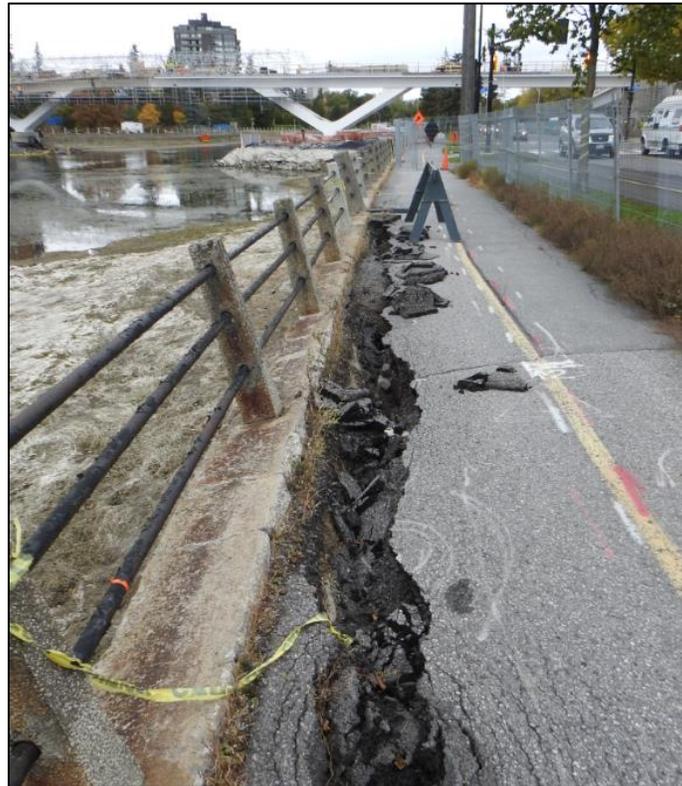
Issues created by the failing wall. Taken October 16, 2018.
